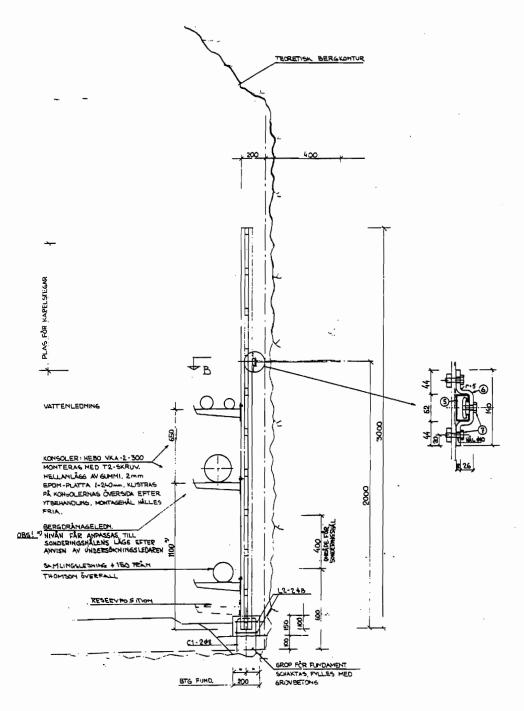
Rack for pipes and cables in the upper part of the access tunnel.
